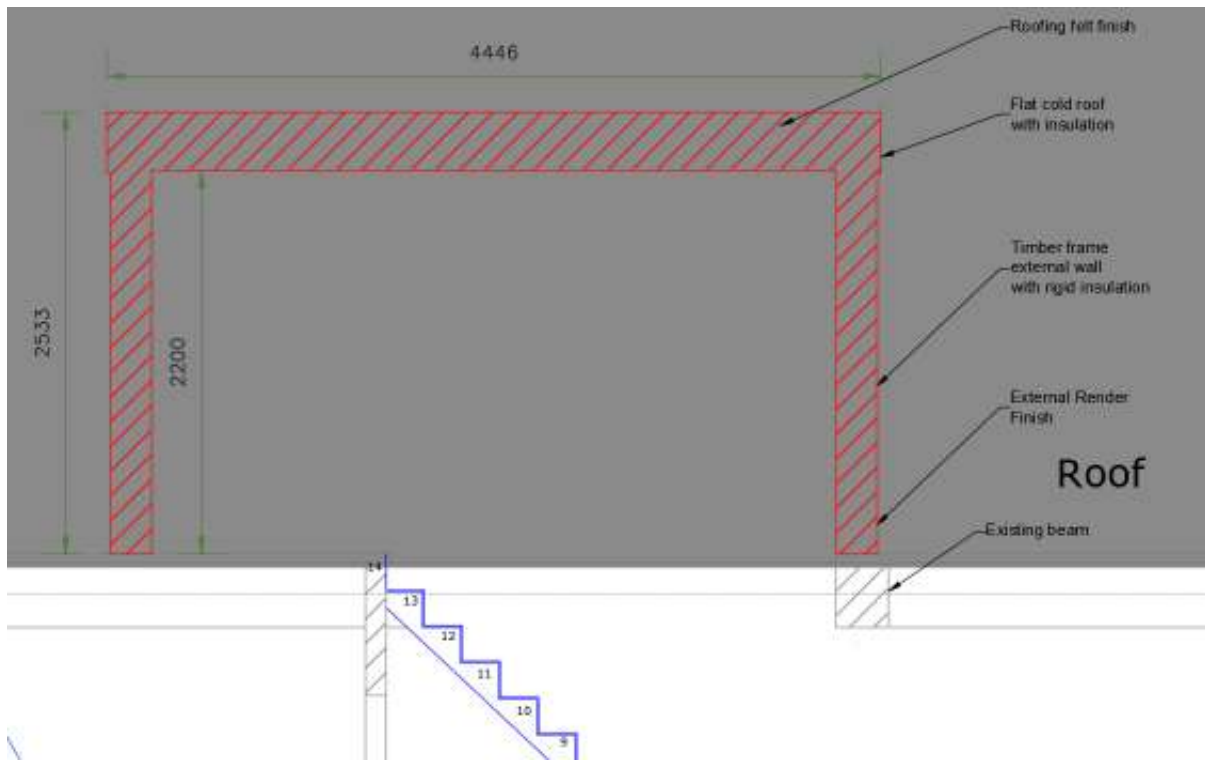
Proposed Section of Rooftop Entrance and new Metal Staircase
